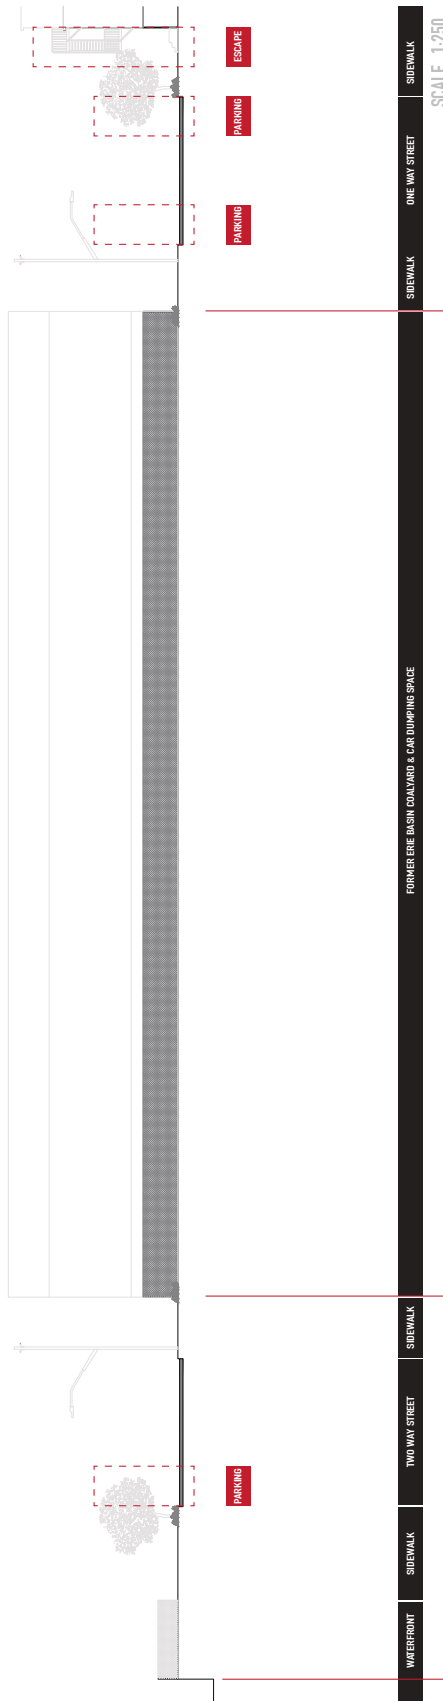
STREETSCAPE ACTIVITIES AT SITE 3 (EBCY-SITE, RICHARDS STREET SOUTH) : SOUTH-NORTH SECTION
